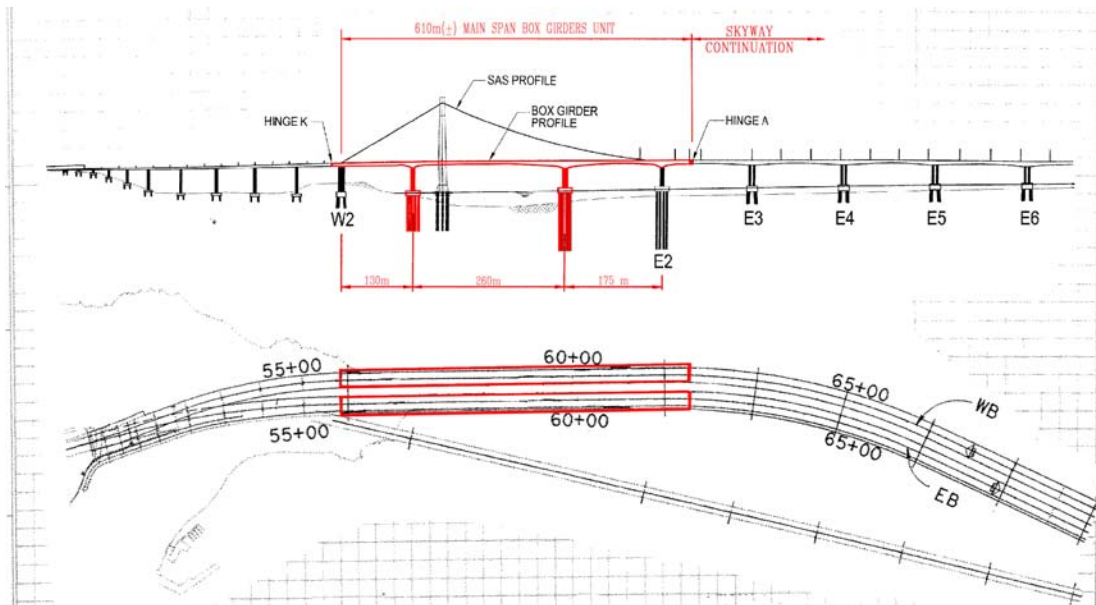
Skyway Concrete Box Girder Re-Design Option
